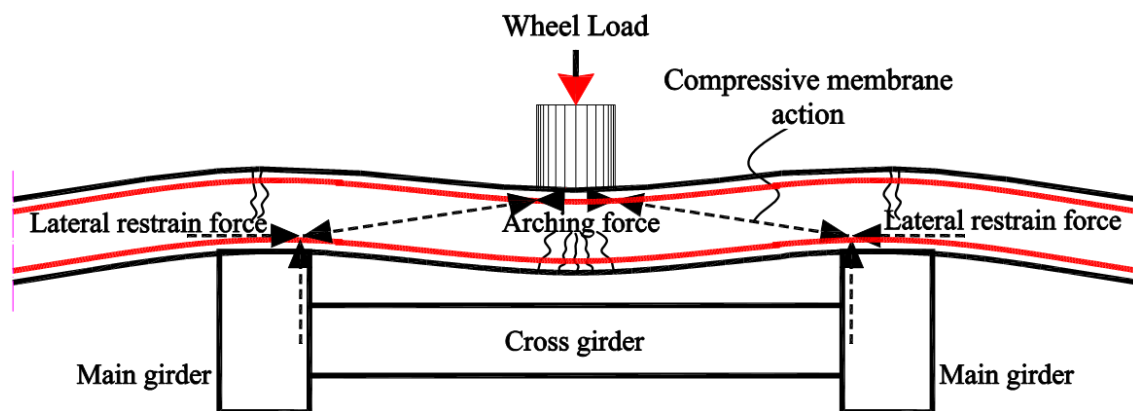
Arching action mechanism in slab-on-girder concrete deck slabs
